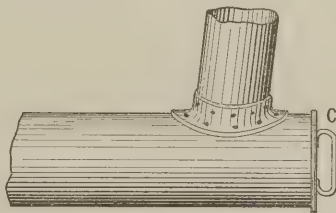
Cover in Horizontal Section for Purpose of Cleaning Pipe.
